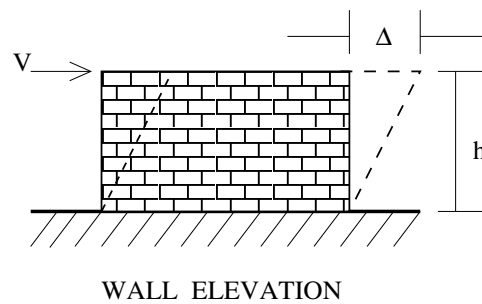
Shear Deformation in a Short Building, (Lin and Stotesbury 1981)
